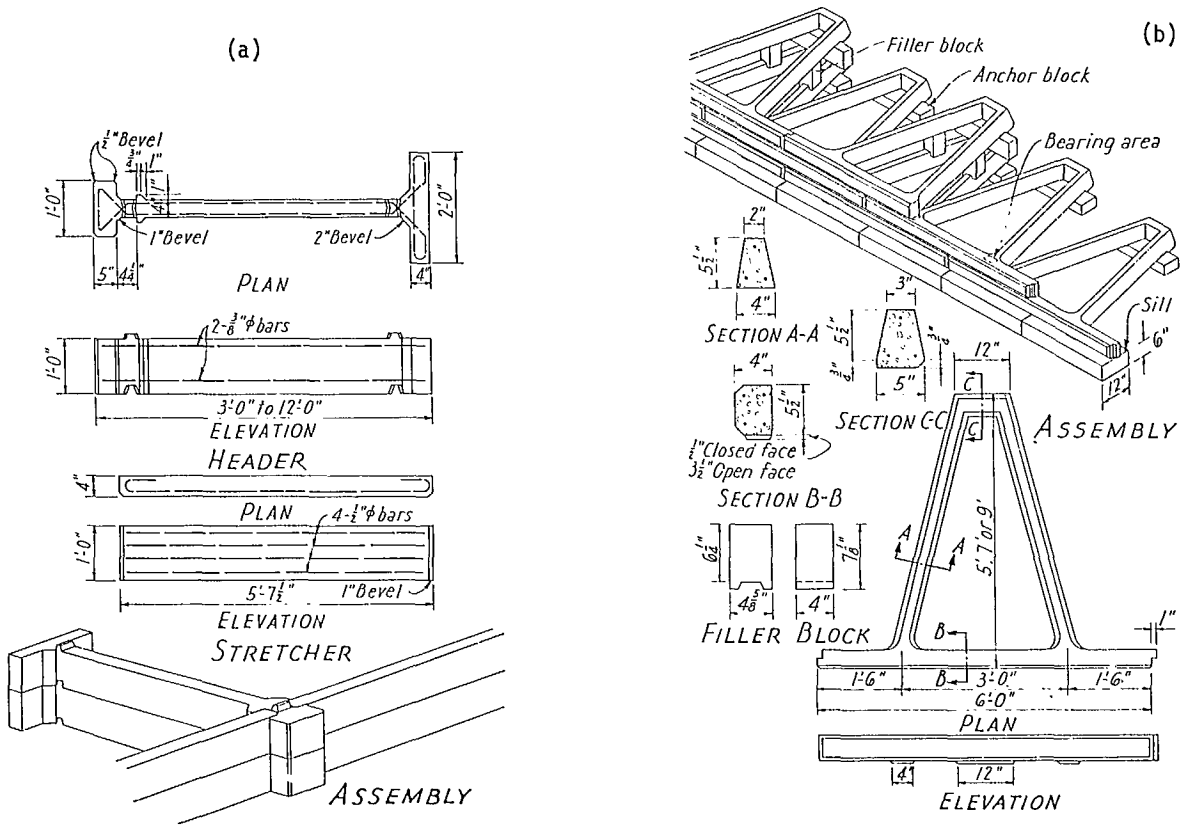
Pre-cast concrete crib walls; a) counterfort-type wall with a flush face. b) Modified bin structure with a discontinuous back wall (17).
